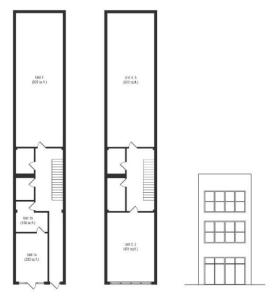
, 588, 589 (left to right) Building 19, first (ground) floor (1913); floors 2–3 (1913); (right) street-front elevation (1981). 1" = 32'. For plans, north is up.
